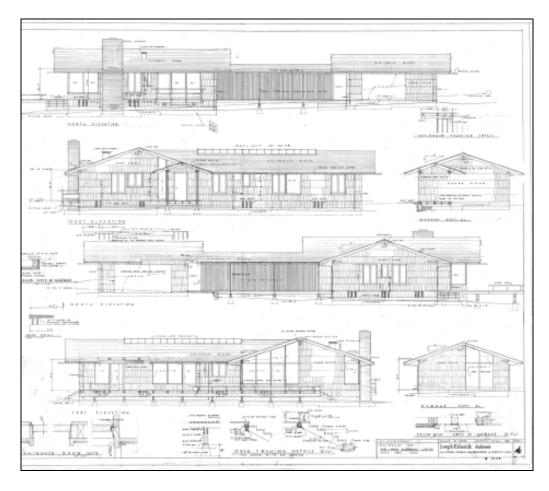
Scan of original elevation drawings by Joseph Esherick (*Courtesy: Jim Larson, owner*).
